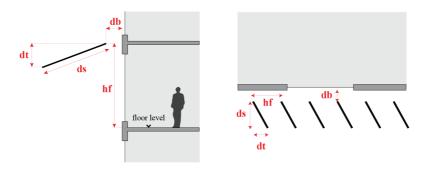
The parameterization of the shading devices on the south façade, side view (left) and on the east and west façade, plan view (right)
